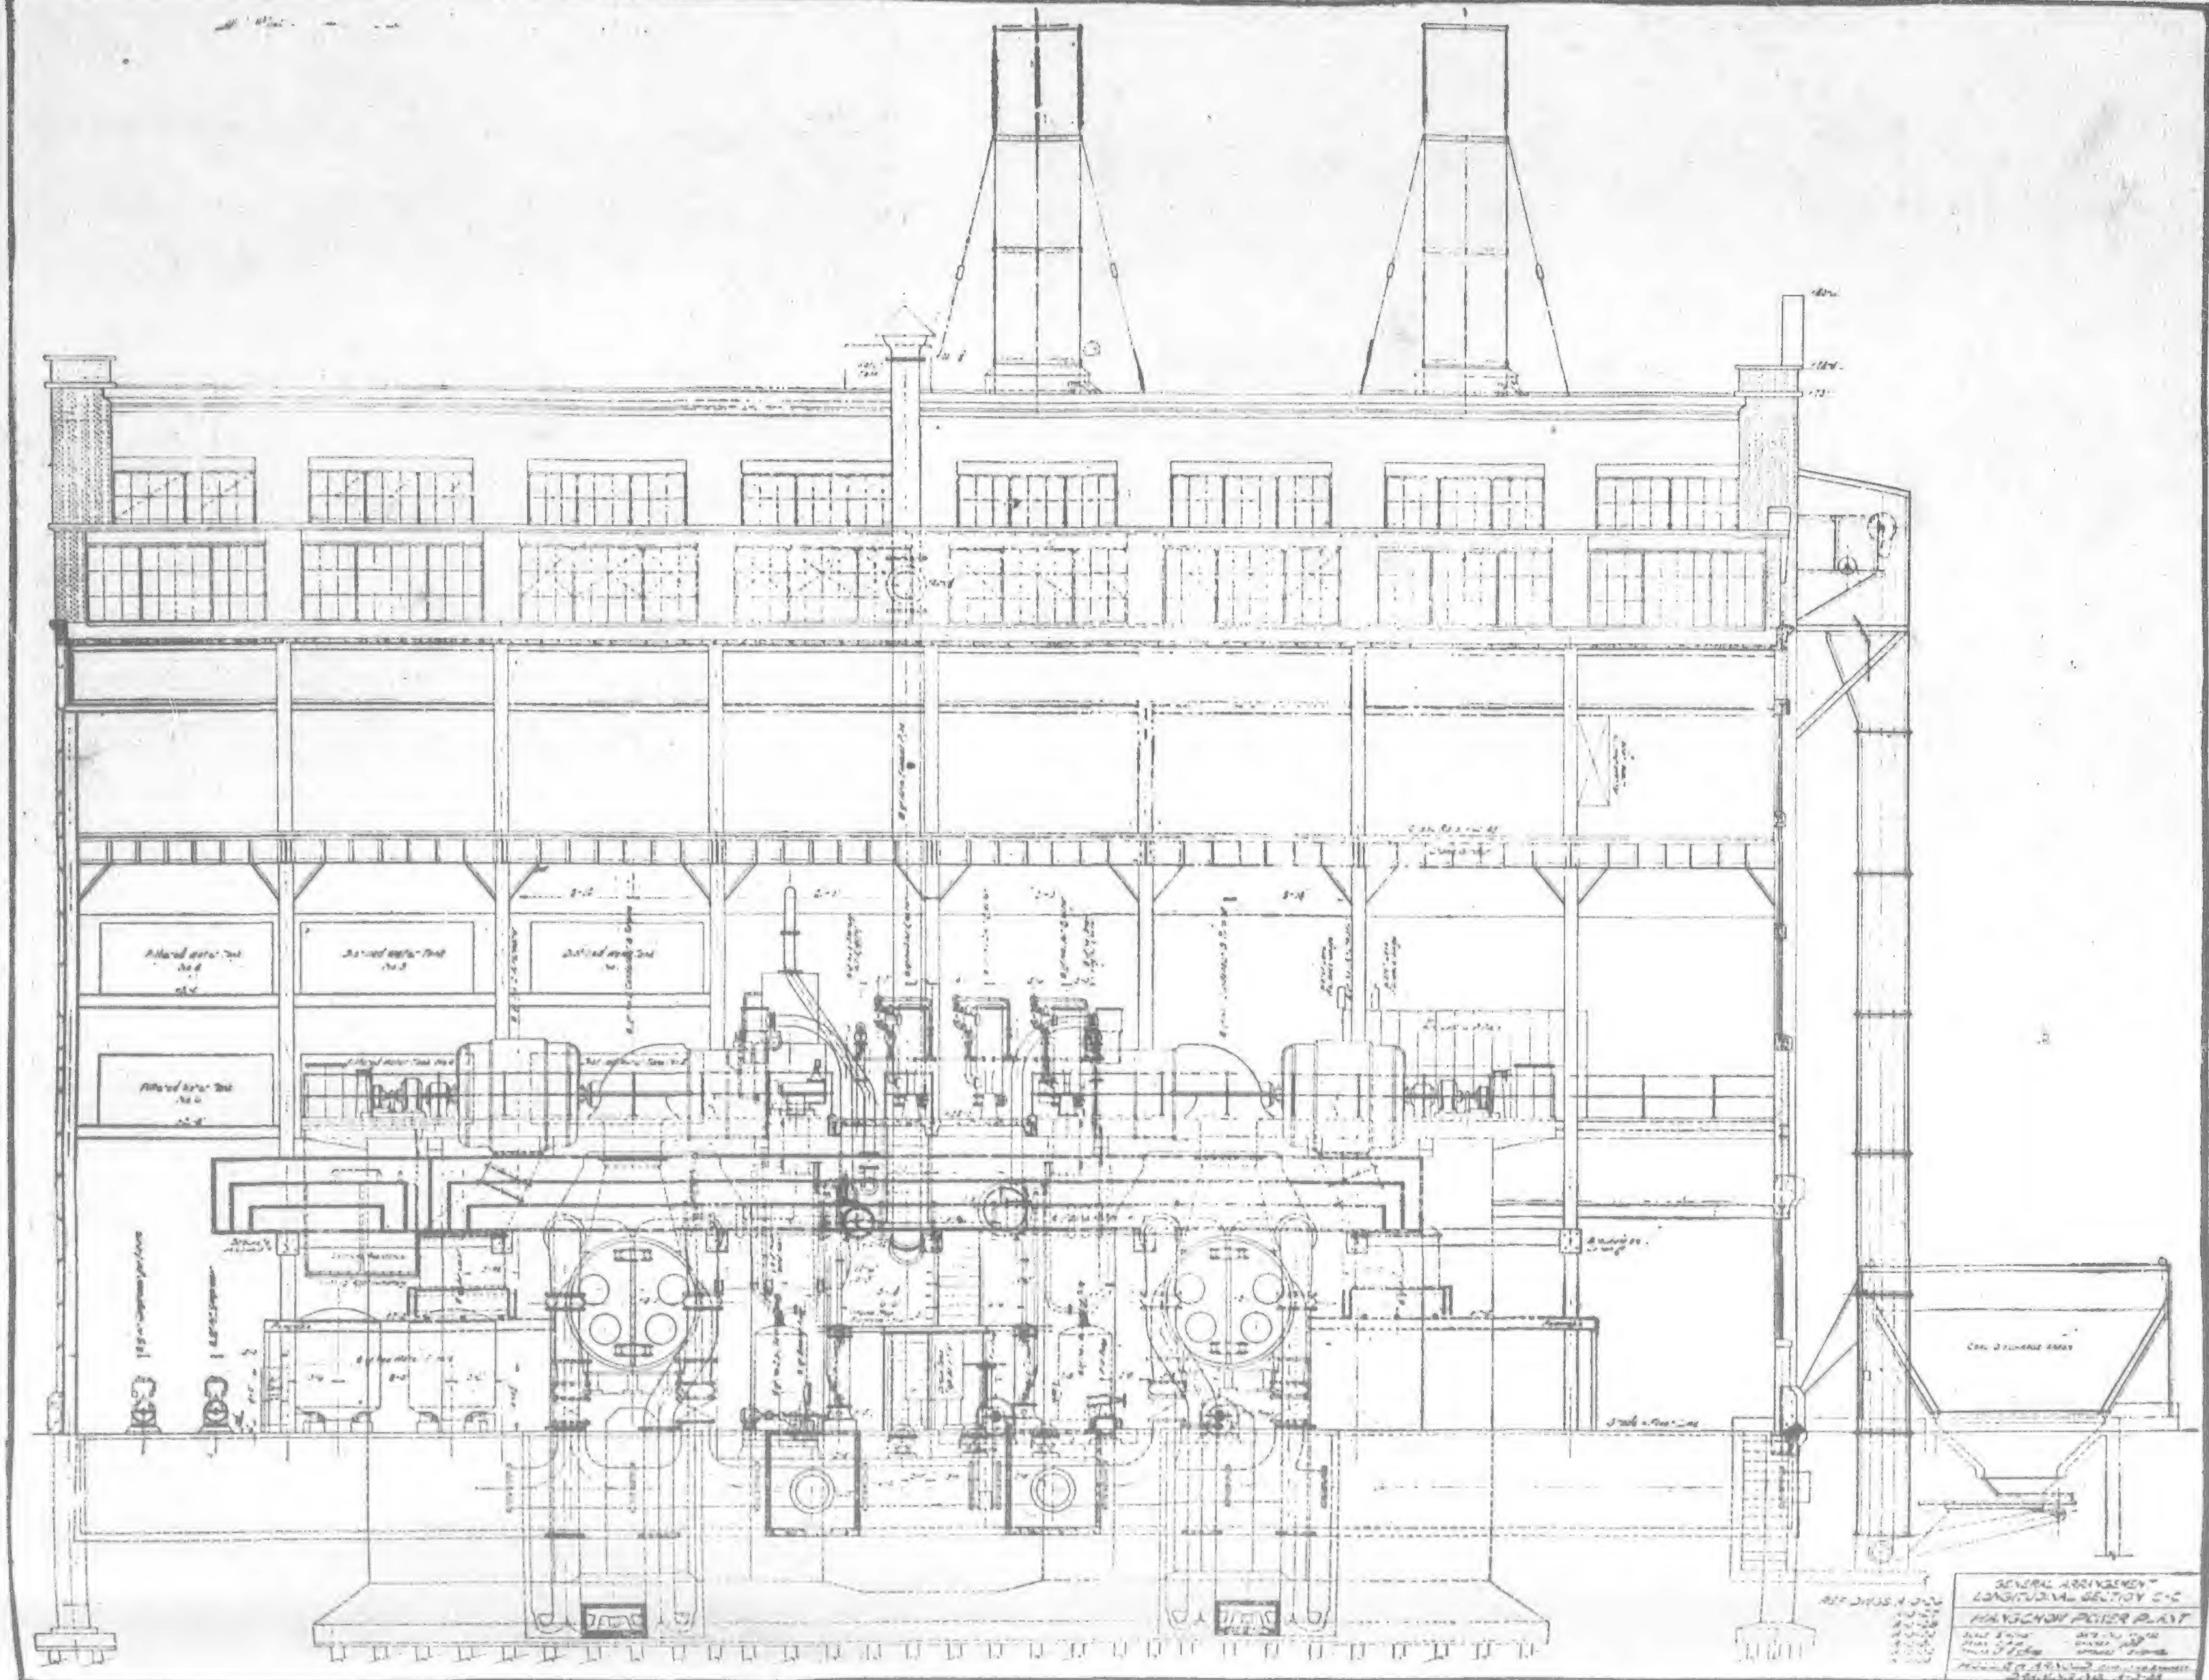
General arrangement, Transverse section Hangchow Power Plant. Scale ¼-in. to 1-ft. Hollis H. Arnold, Consulting Engineer
